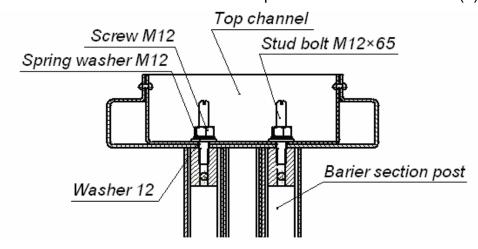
Fixing the top channel (13) to the barrier section (3)
